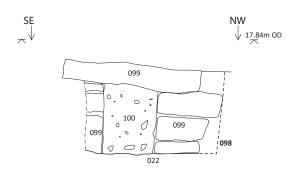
North-east facing section of culvert 099 (see Figure 07 for location)
